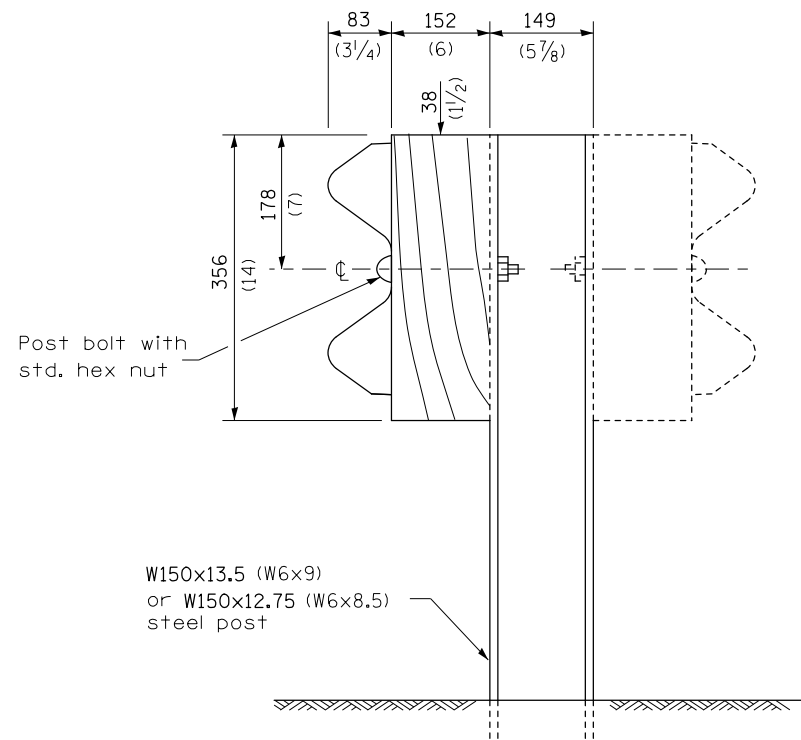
1/2" STEEL PLATE BEAM GUARDRAIL
